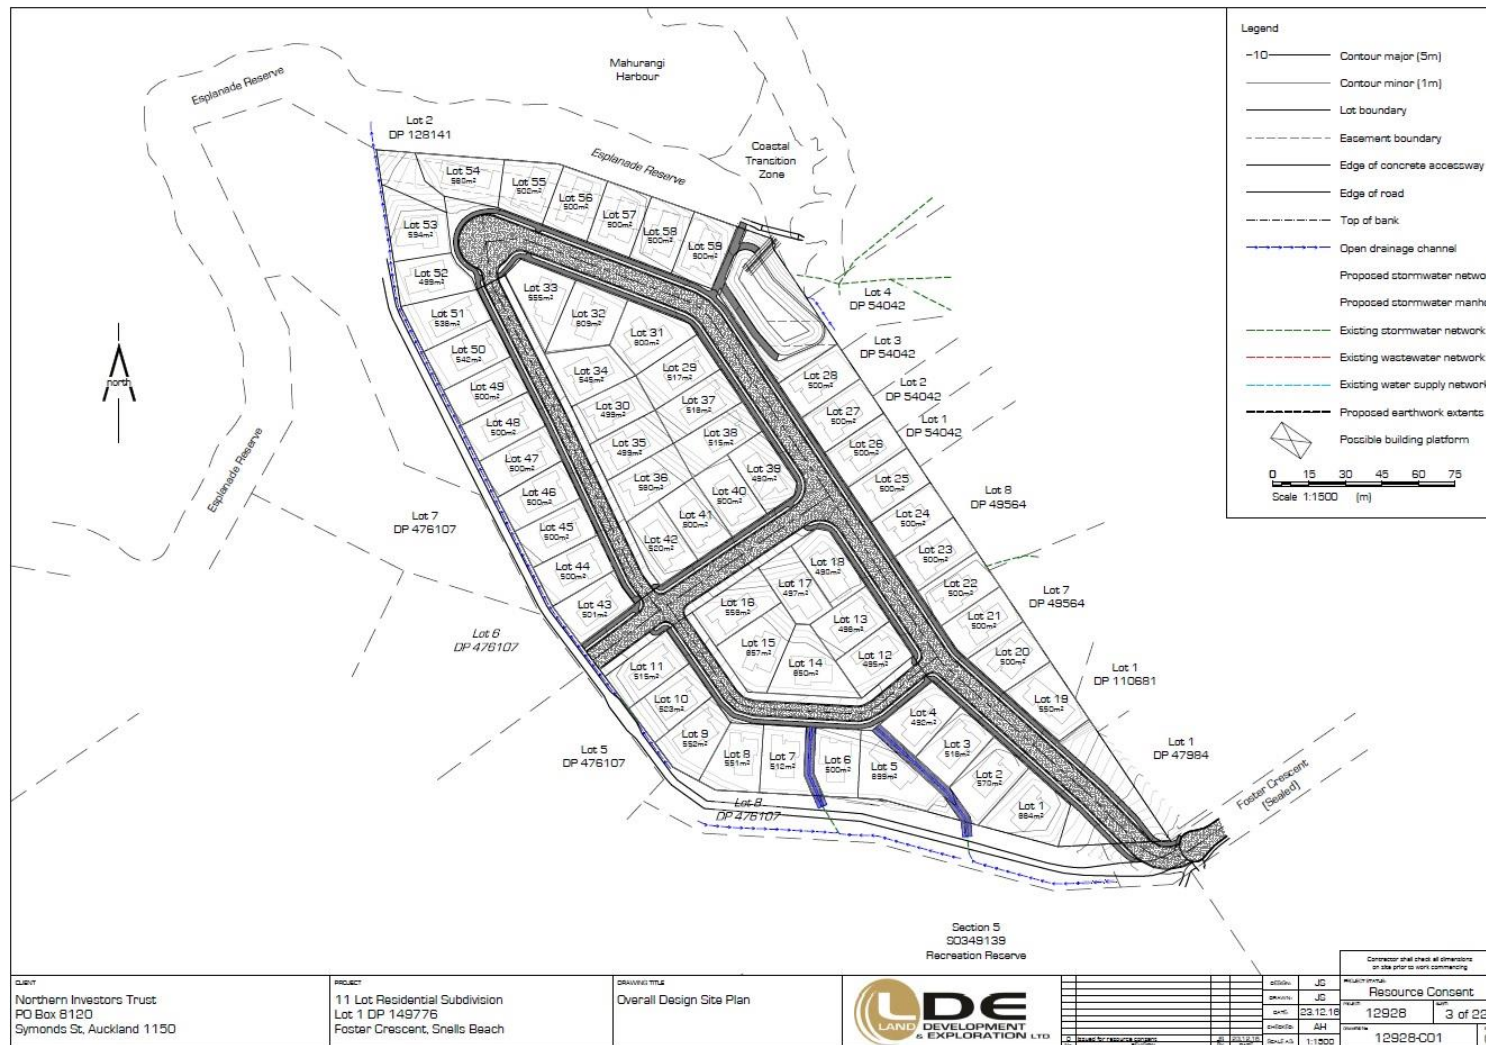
Proposed Subdivision Plan (Land Development and Exploration Ltd 2017)
